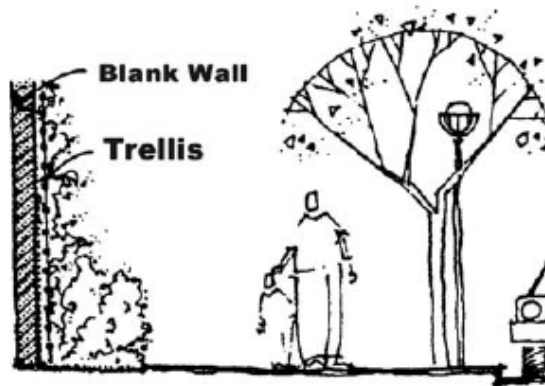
A planting bed and generous landscaping used to screen a blank wall.
